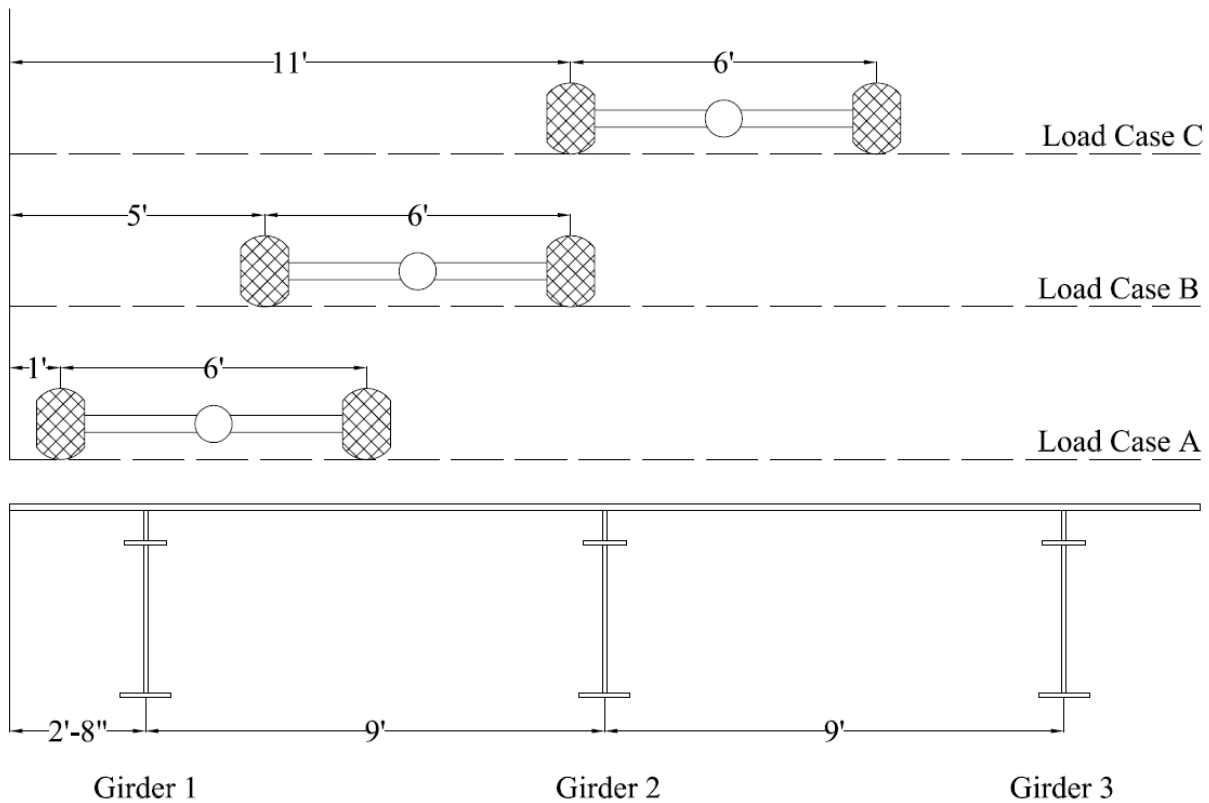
Loading Cases used for validation of Shenley Bridge model
